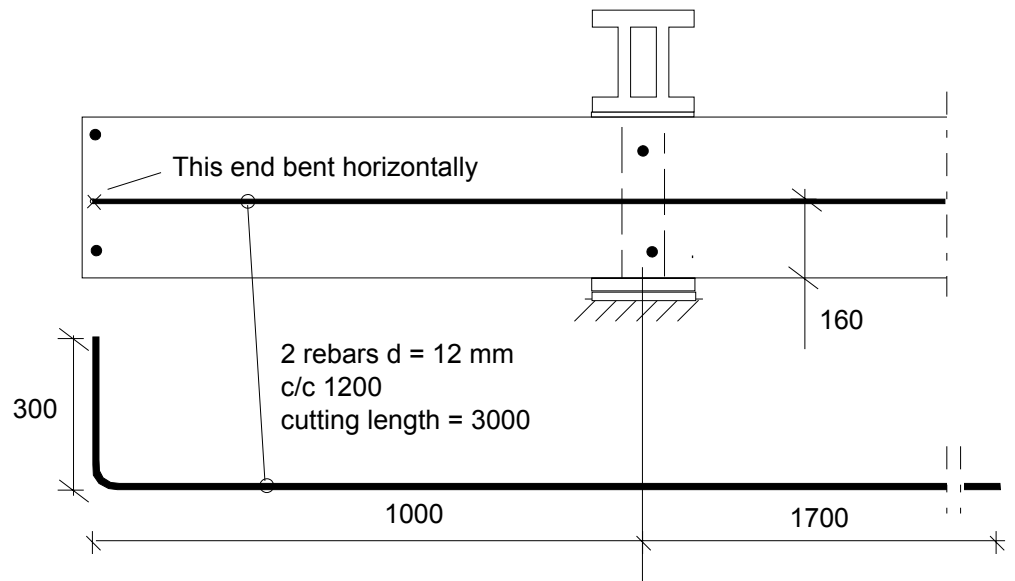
Tests B1 ... B3. Arrangements at support, section B – B, see Fig. 3.
